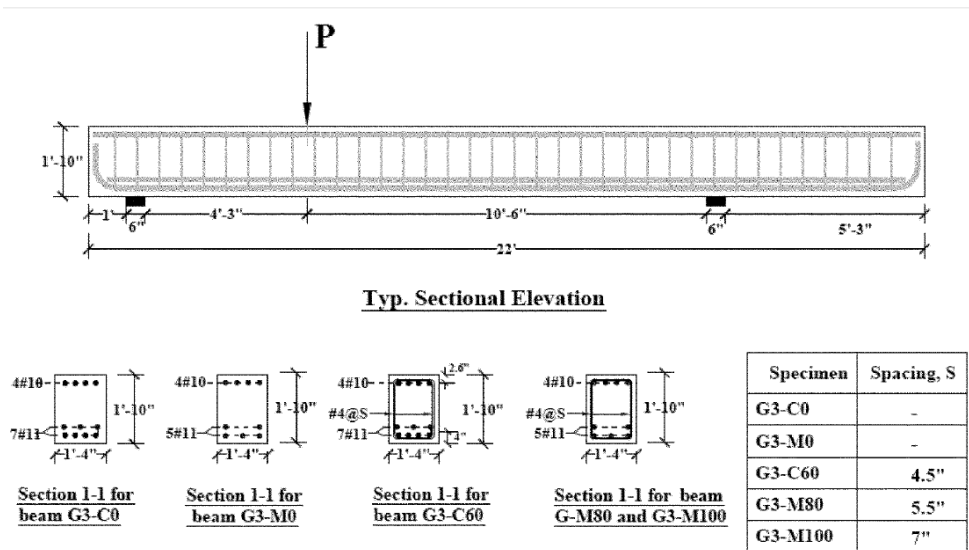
Typical cross sections for beams of Groups 1, 2, and 3.
